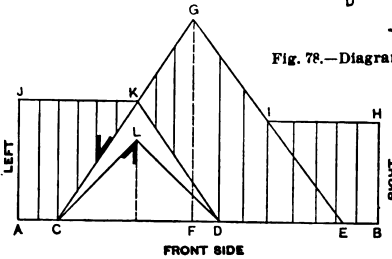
Front Elevation of Roof Plan Shown in Fig. 79.
